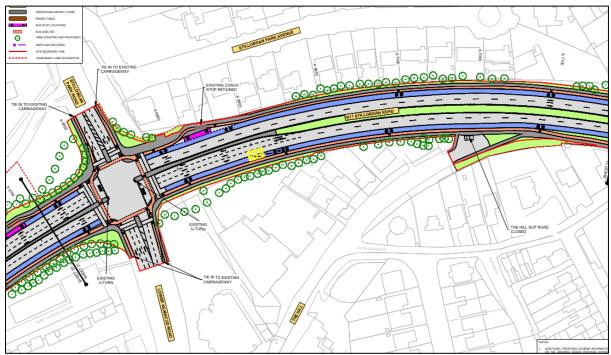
Extract from General Arrangement Drawings at Hill Road junction (Sheet 24)
